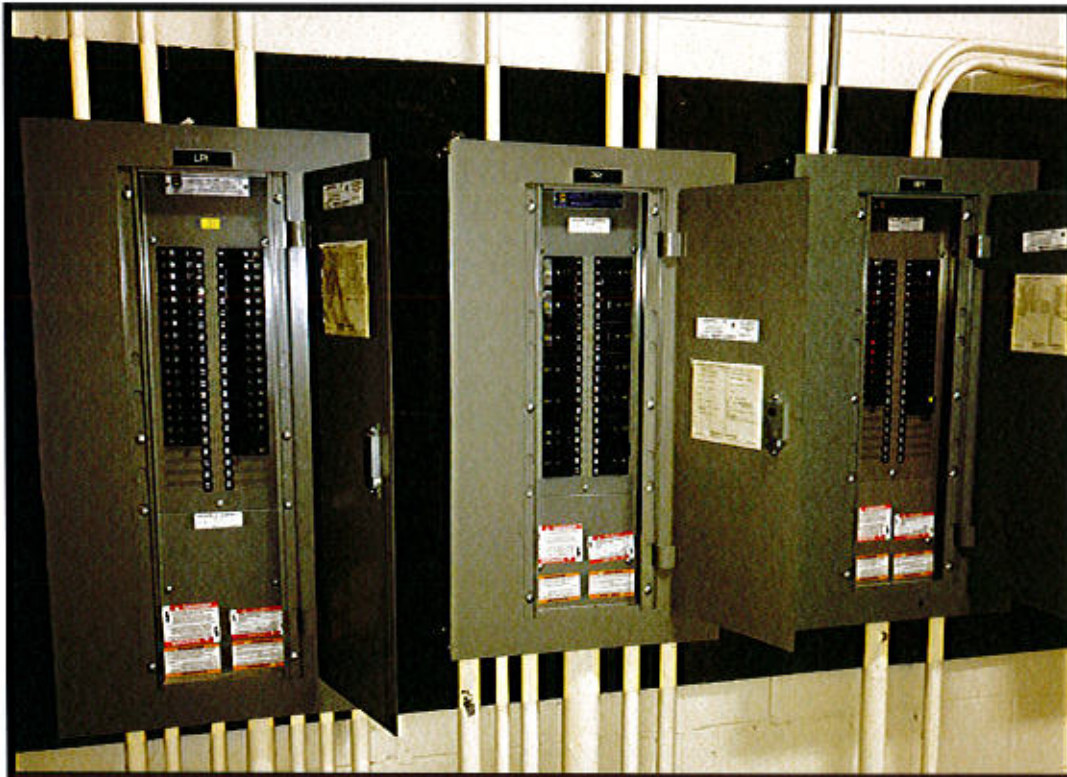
Hartford Bridge & Electrical Maintenance Facility –
